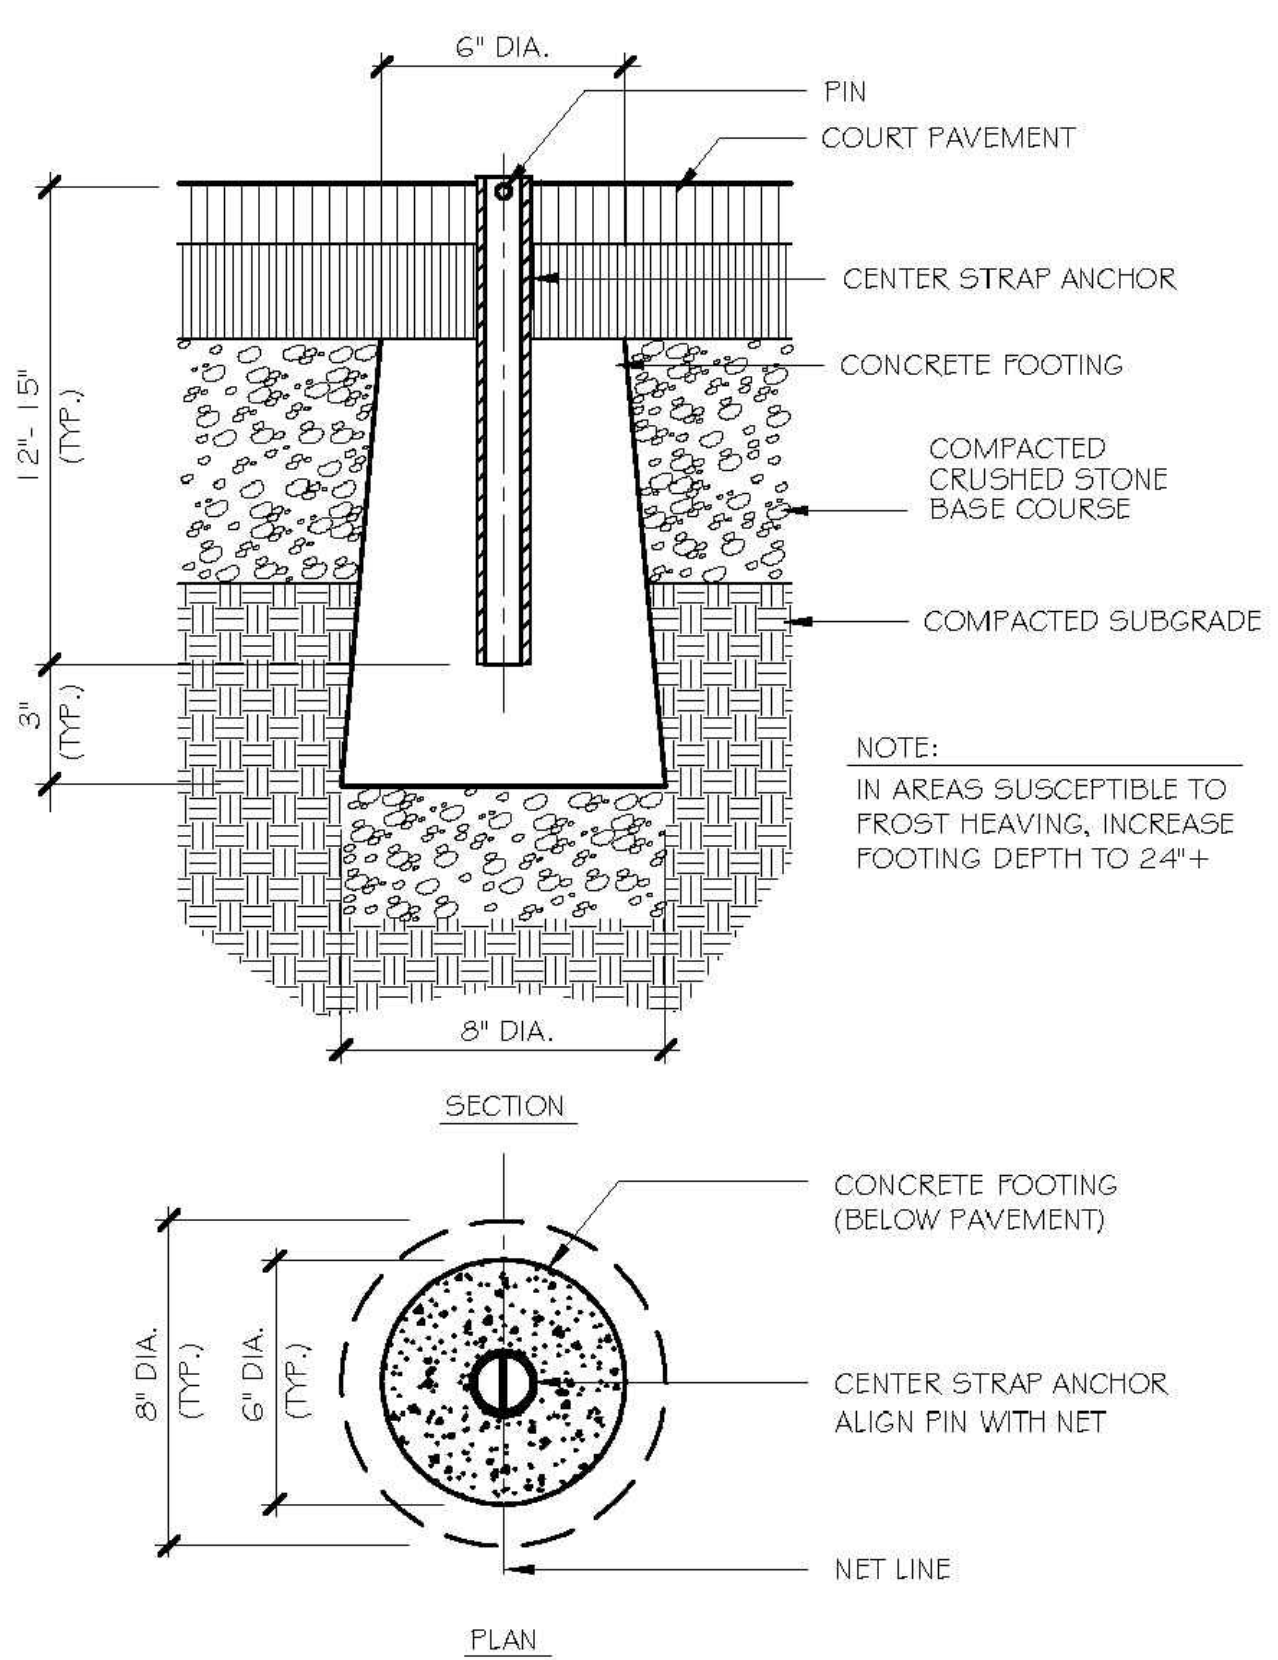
DETAILS OF POST-TENSIONED CONCRETE COURT PAVEMENT
